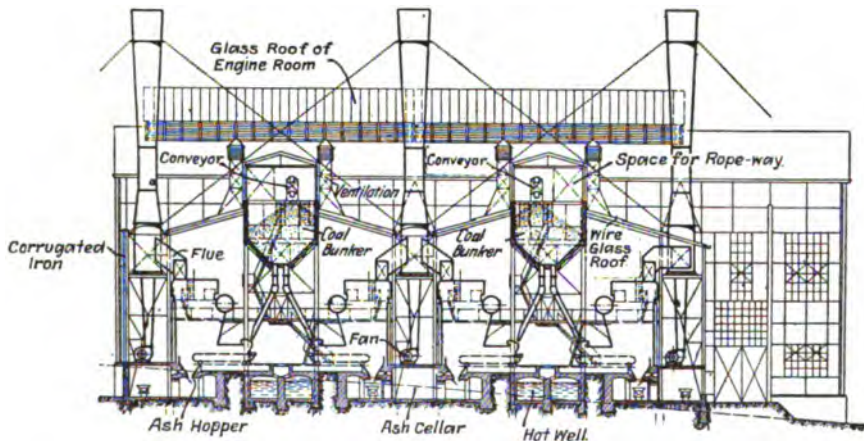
Vereeniging Power Station. Section through Boiler Houses. Scale, 1 to 600.
